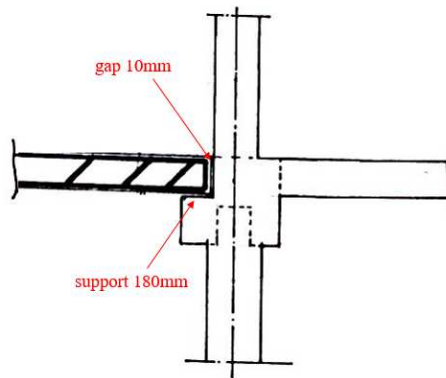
Detail of the thermal joints (adapted from original drawings)
